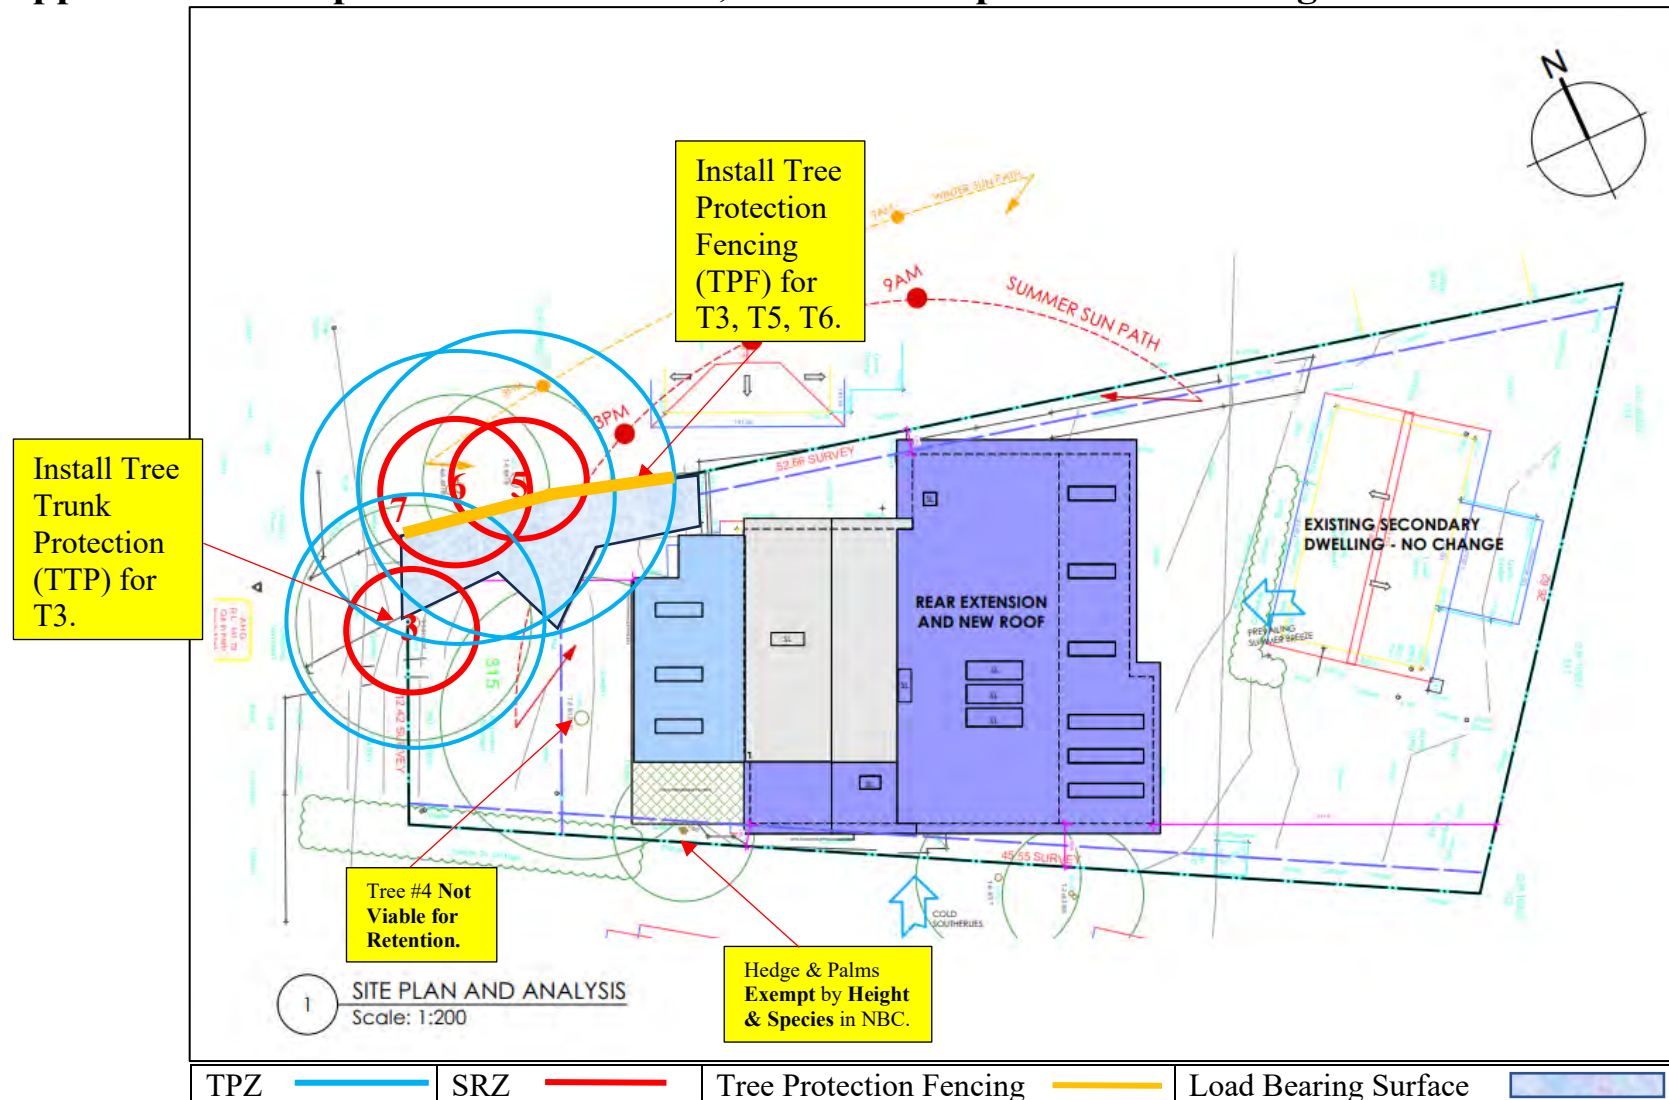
, Tree Protection Diagram. (extract from site and analysis plan).
